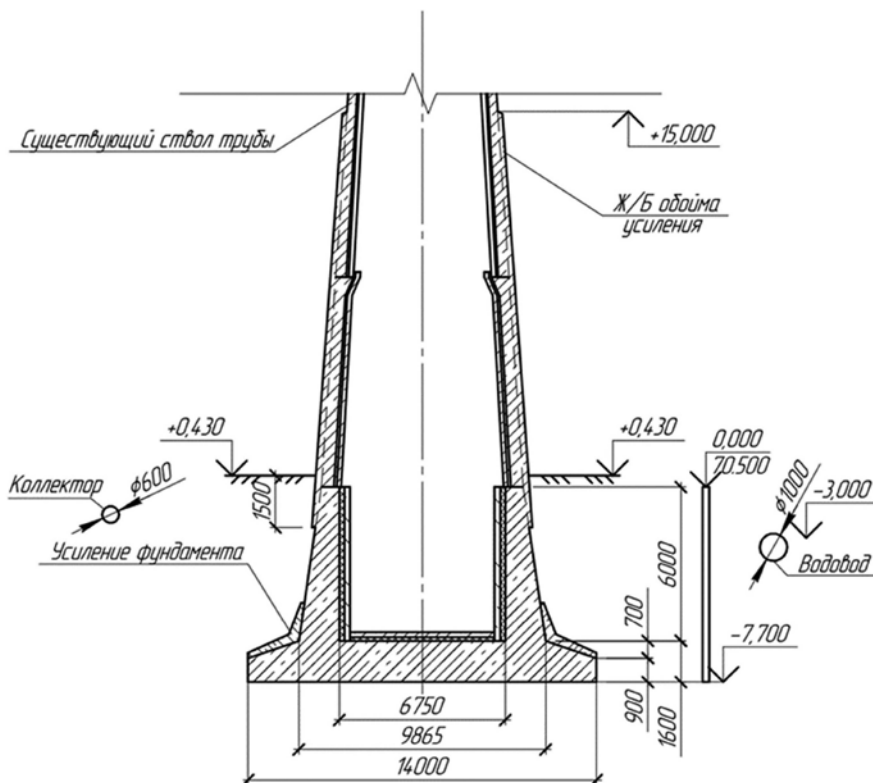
Monolithic reinforced concrete casing reinforcing the chimney shaft of coke oven battery No. 5.
